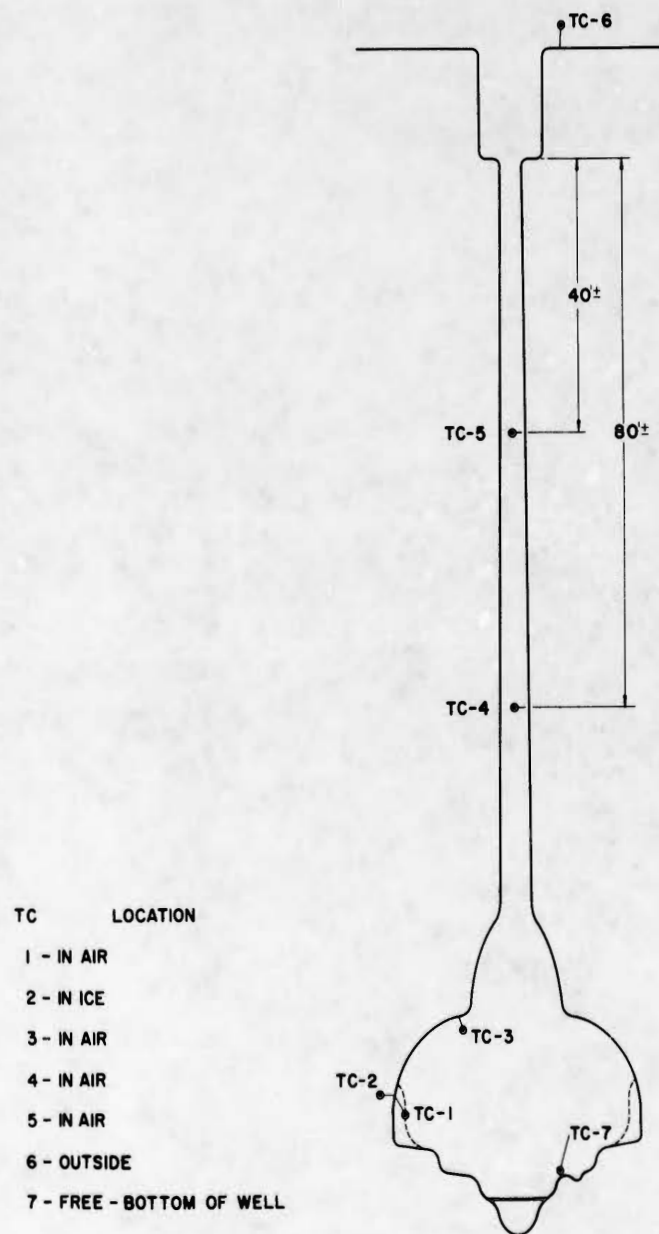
Cross-sectional drawing of cavity and shaft - summer 1959.
